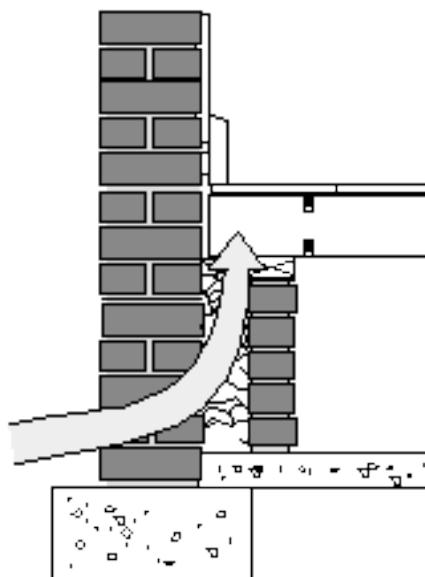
Debris or builder's rubbish may bridge the DPC
